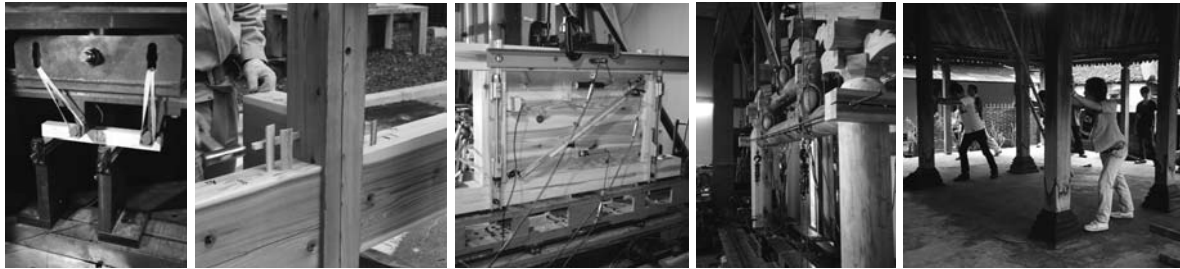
The photo of the experiment. From left to right: Material test of hardwood used as fasteners of the joint; Complicated Japanese traditional joint specimen; Small scaled in-plane shear test of plank shear wall with hardwood shear key; The racking strength test of Taiwanese traditional frame; In-situ measurement of dynamic vibration property of Indonesian traditional building.
